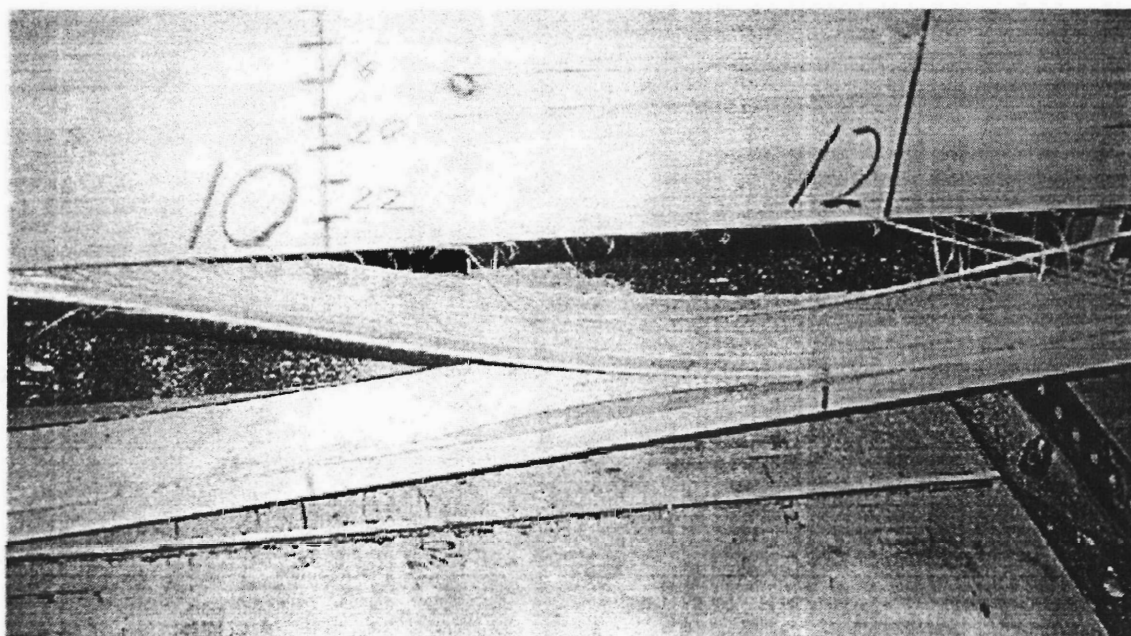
Photograph showing shear failure in reinforcement and wood at the reinforcement-wood interface.
